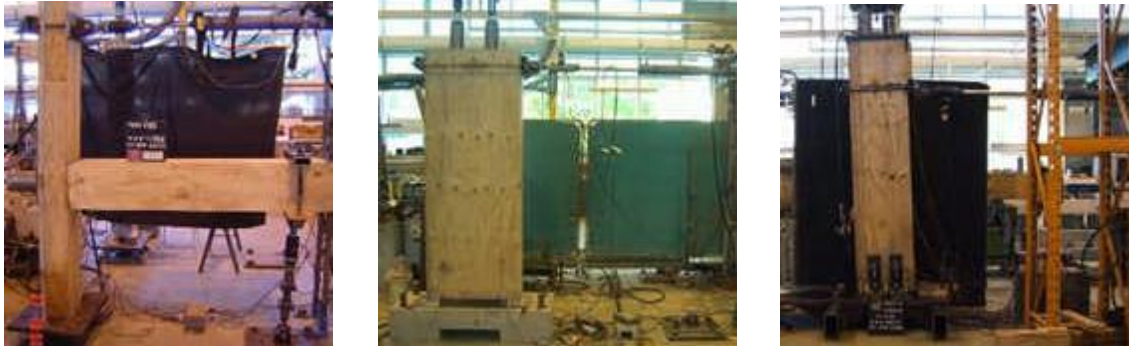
Examples of beam-column joint, wall to foundation joint and column to foundation joint [12]
